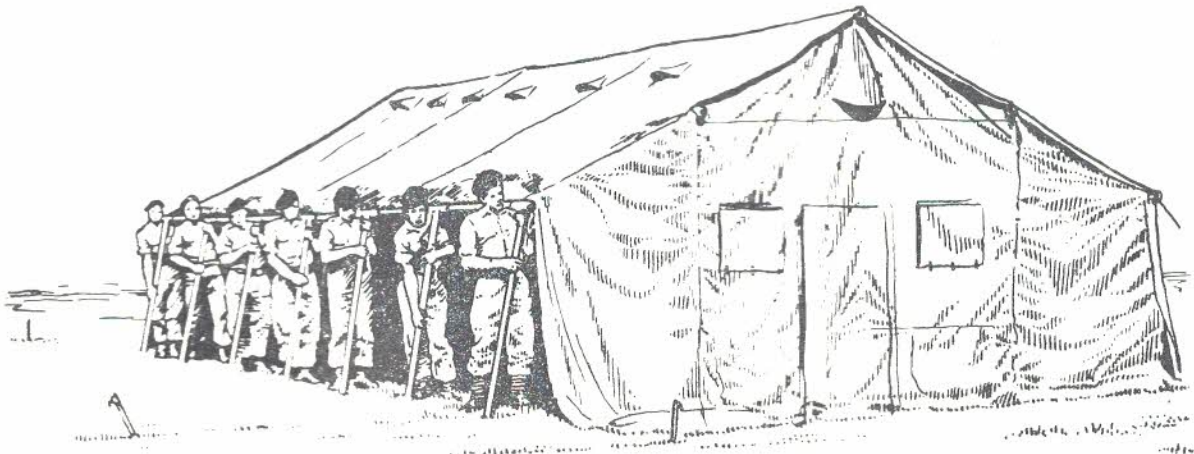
FITTING UPPER WALL SUPPORTS TO EAVE LINE (SIDE 1)
